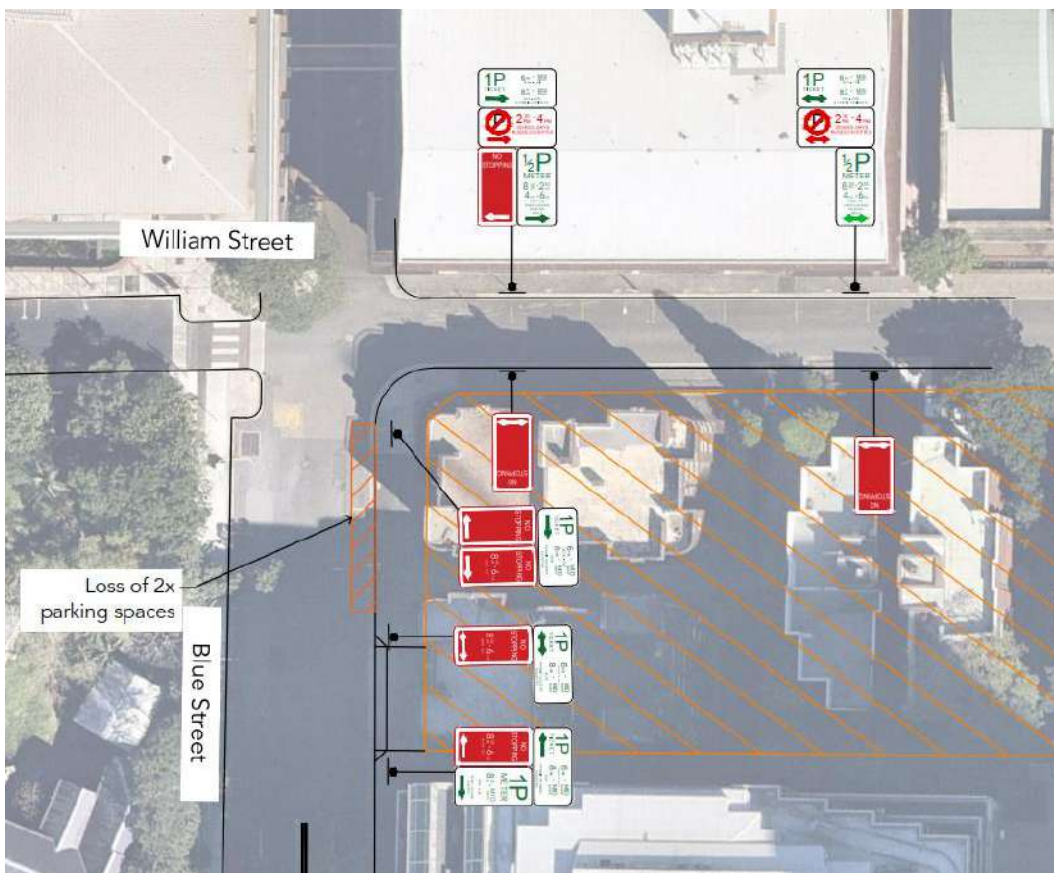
Proposed Signage Plan in William Street and Blue Street Intersection (Excavation Only)
